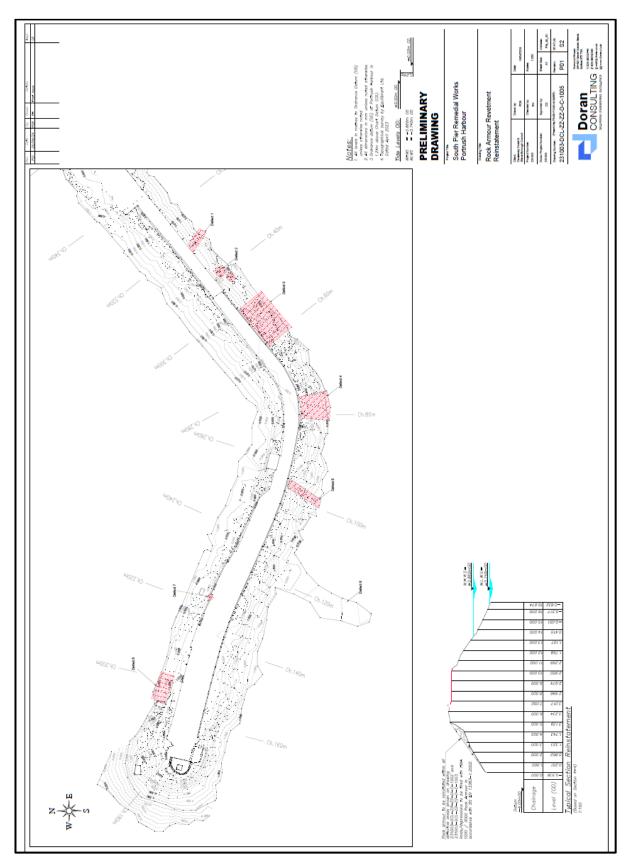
Rock Armour Revetment Reinstatement, Portrush South Pier
